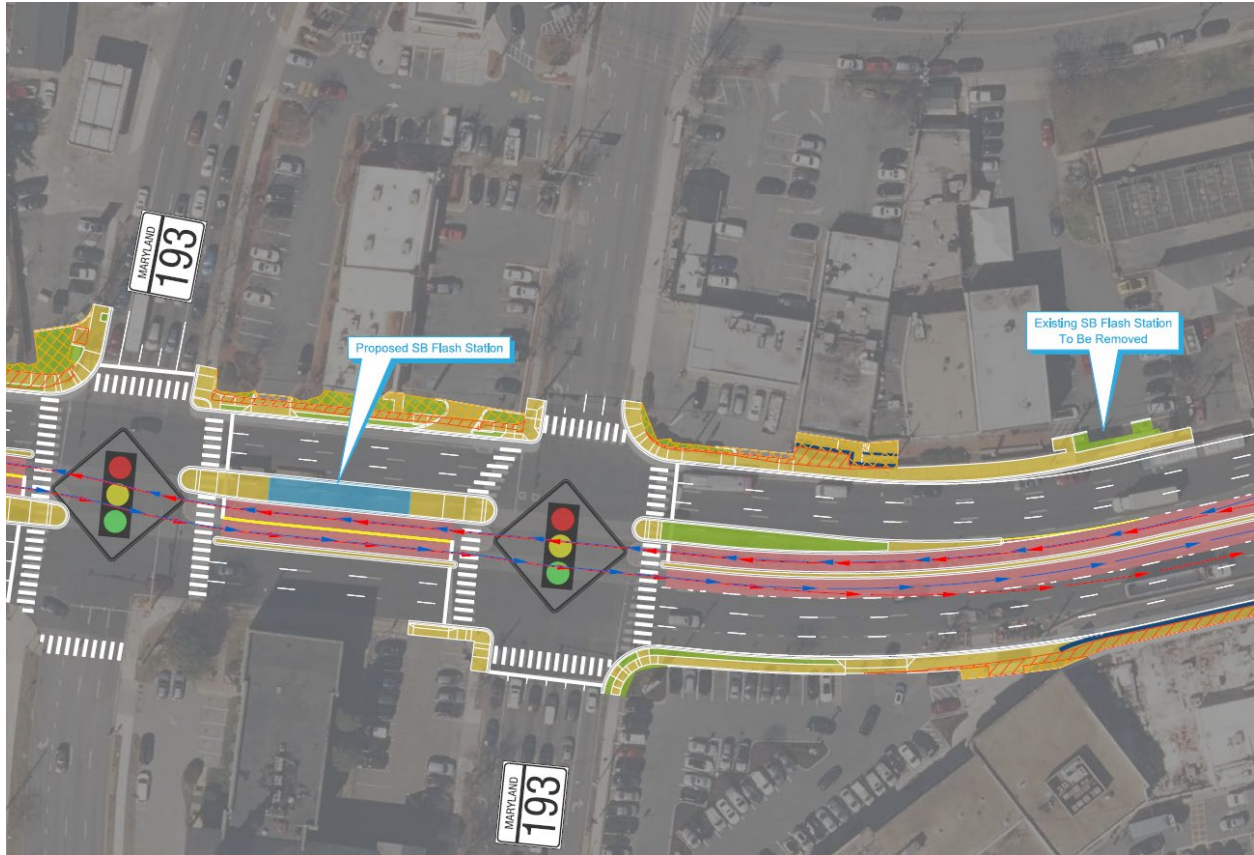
Existing and Proposed Southbound Flash Station (Four Corners)
